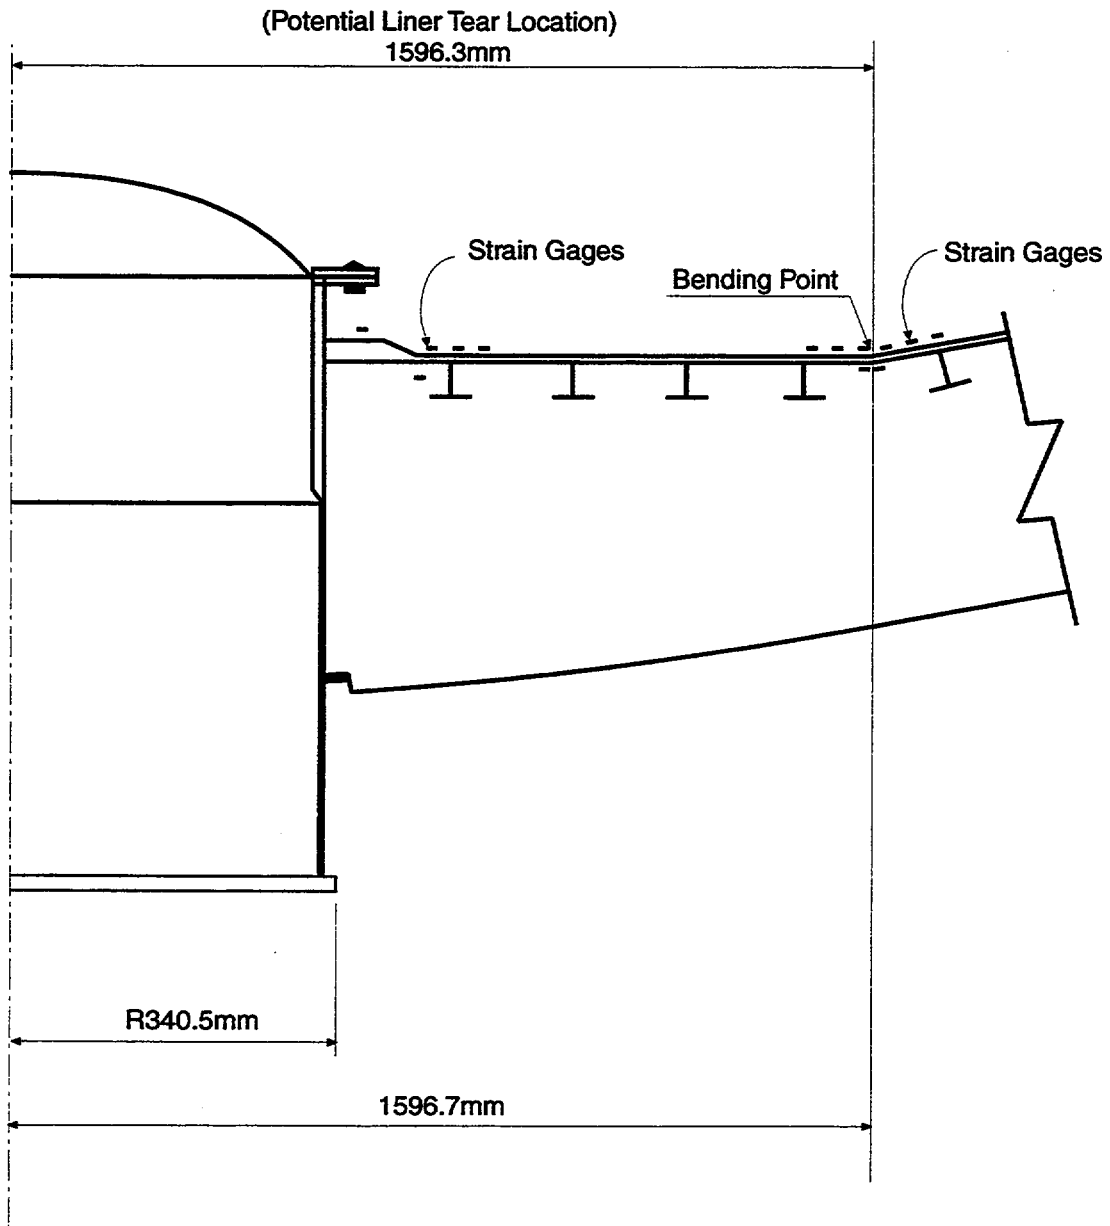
Plan Section View of Equipment Hatch Showing Typical Liner Strain Gages at Potential High Strain Locations
